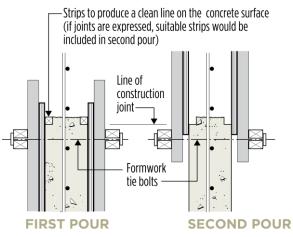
Horizontal Construction Joint in a Wall when a Clean, Neat Line is needed
